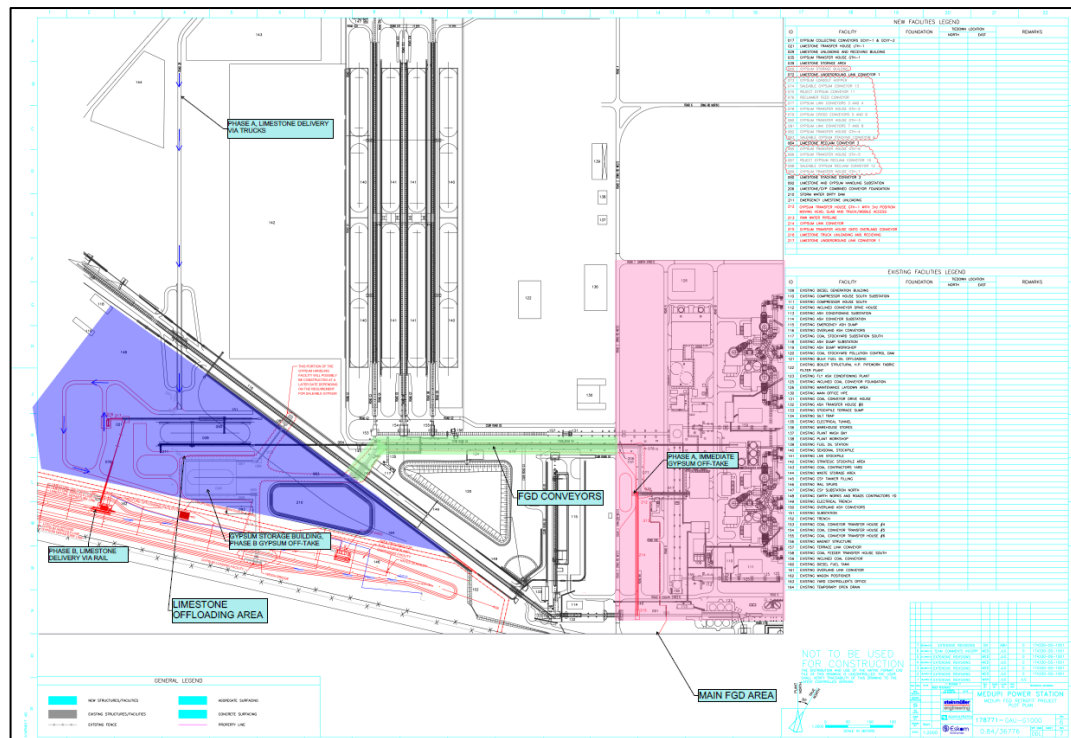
Site plan – Ref: Medupi Power Station Dwg No. 178771 – GAU – G1000
